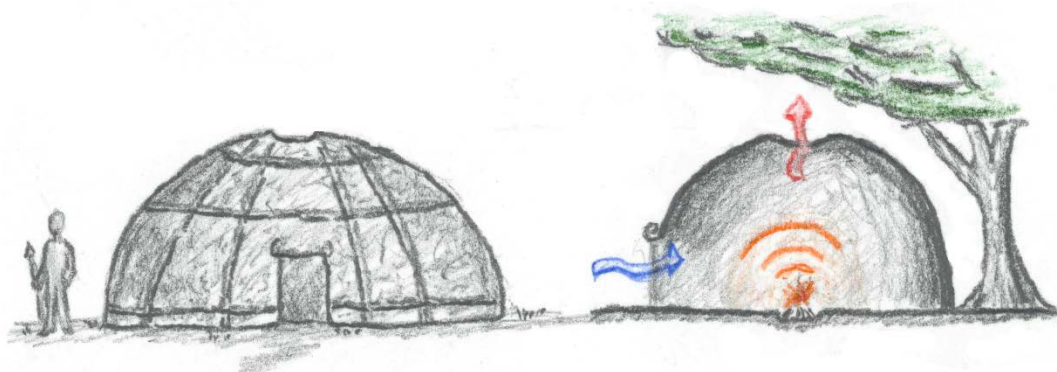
Yeahawkan Elevation & Section (Source: Author)
